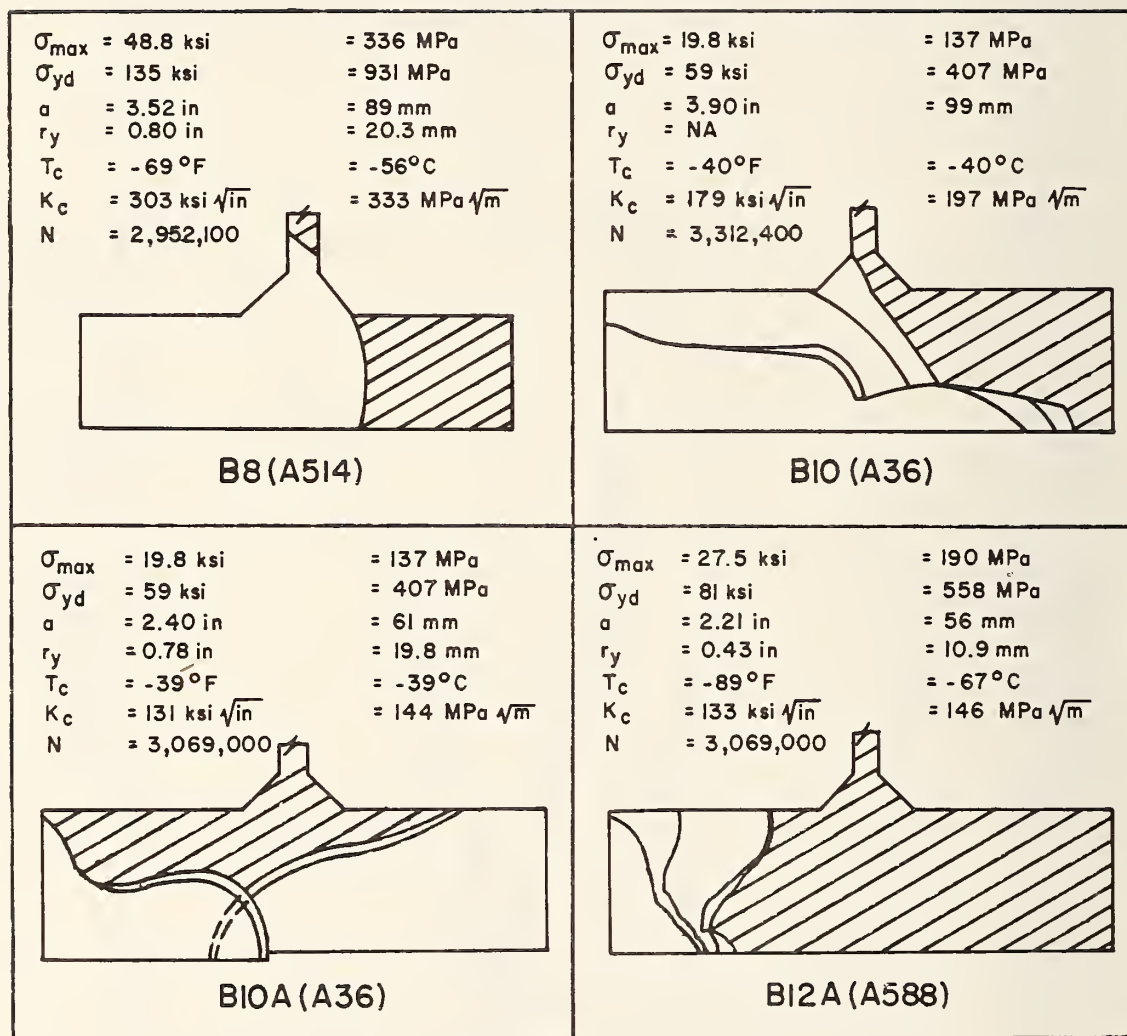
Fracture Surface Sketches and Data Summary
